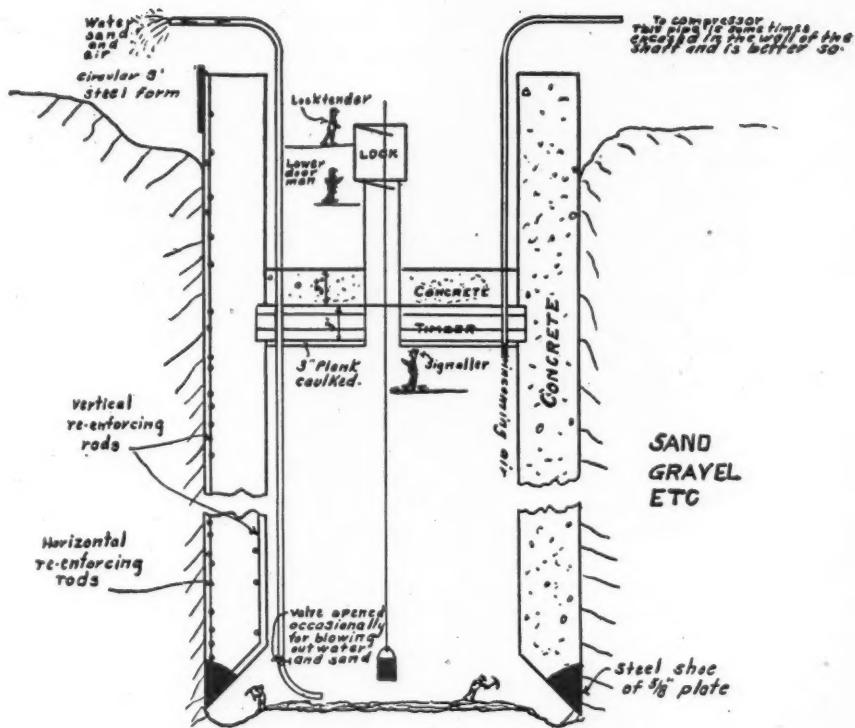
SKETCH OF SHAFT SINKING OPERATION.
